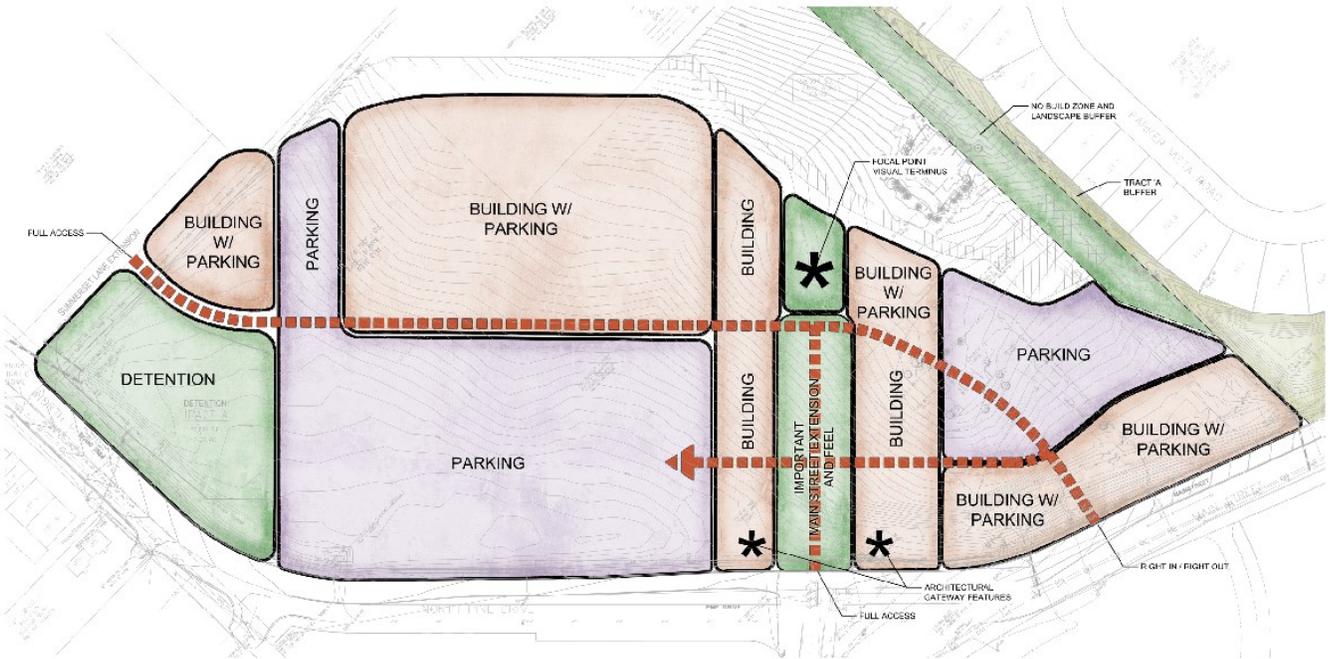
CONCEPTUAL SITE PLAN
